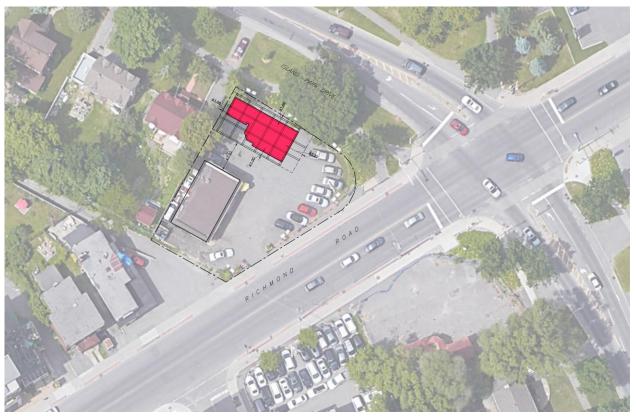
Temporary building storage location for the Service Station has ben negotiated and will be stored directly across the road.
